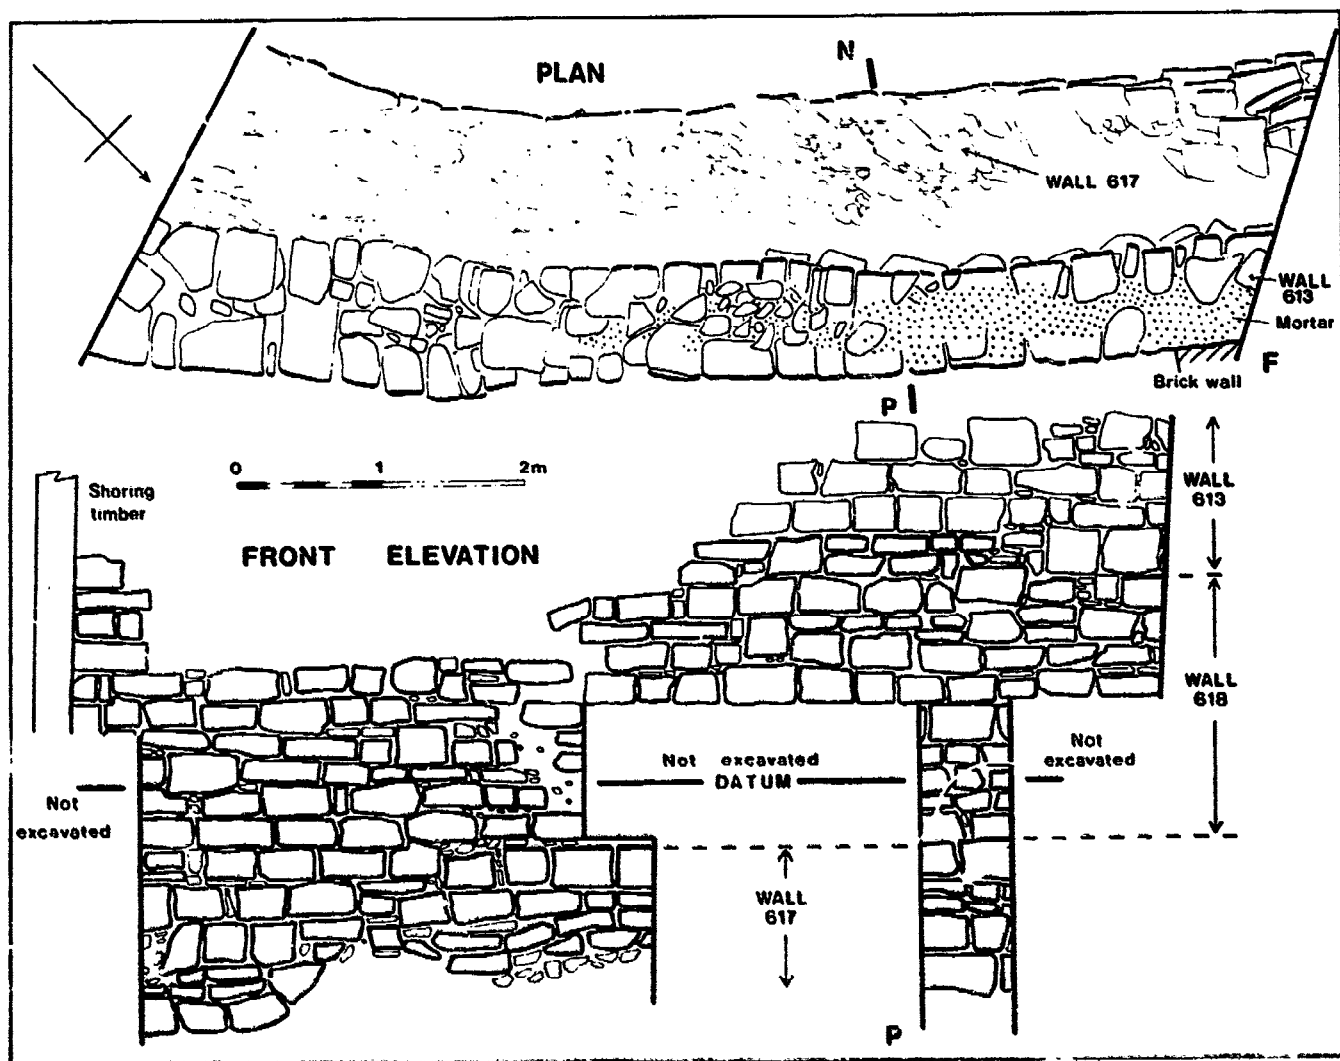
Cantilupe Street. Period 4: plan and front elevation of the medieval wall, 617. Period 5: rebuilds 613 and 618. Section N - P is shown on fig 53:M1.G0
